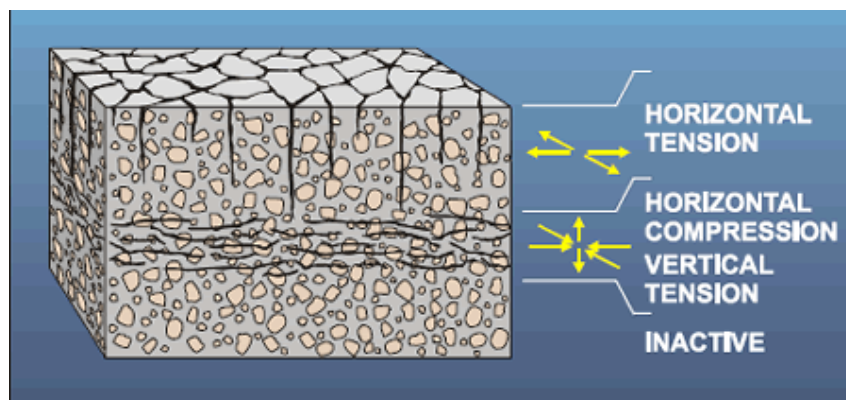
Idealized sketch of AAR cracking pattern in concrete mass [3]
